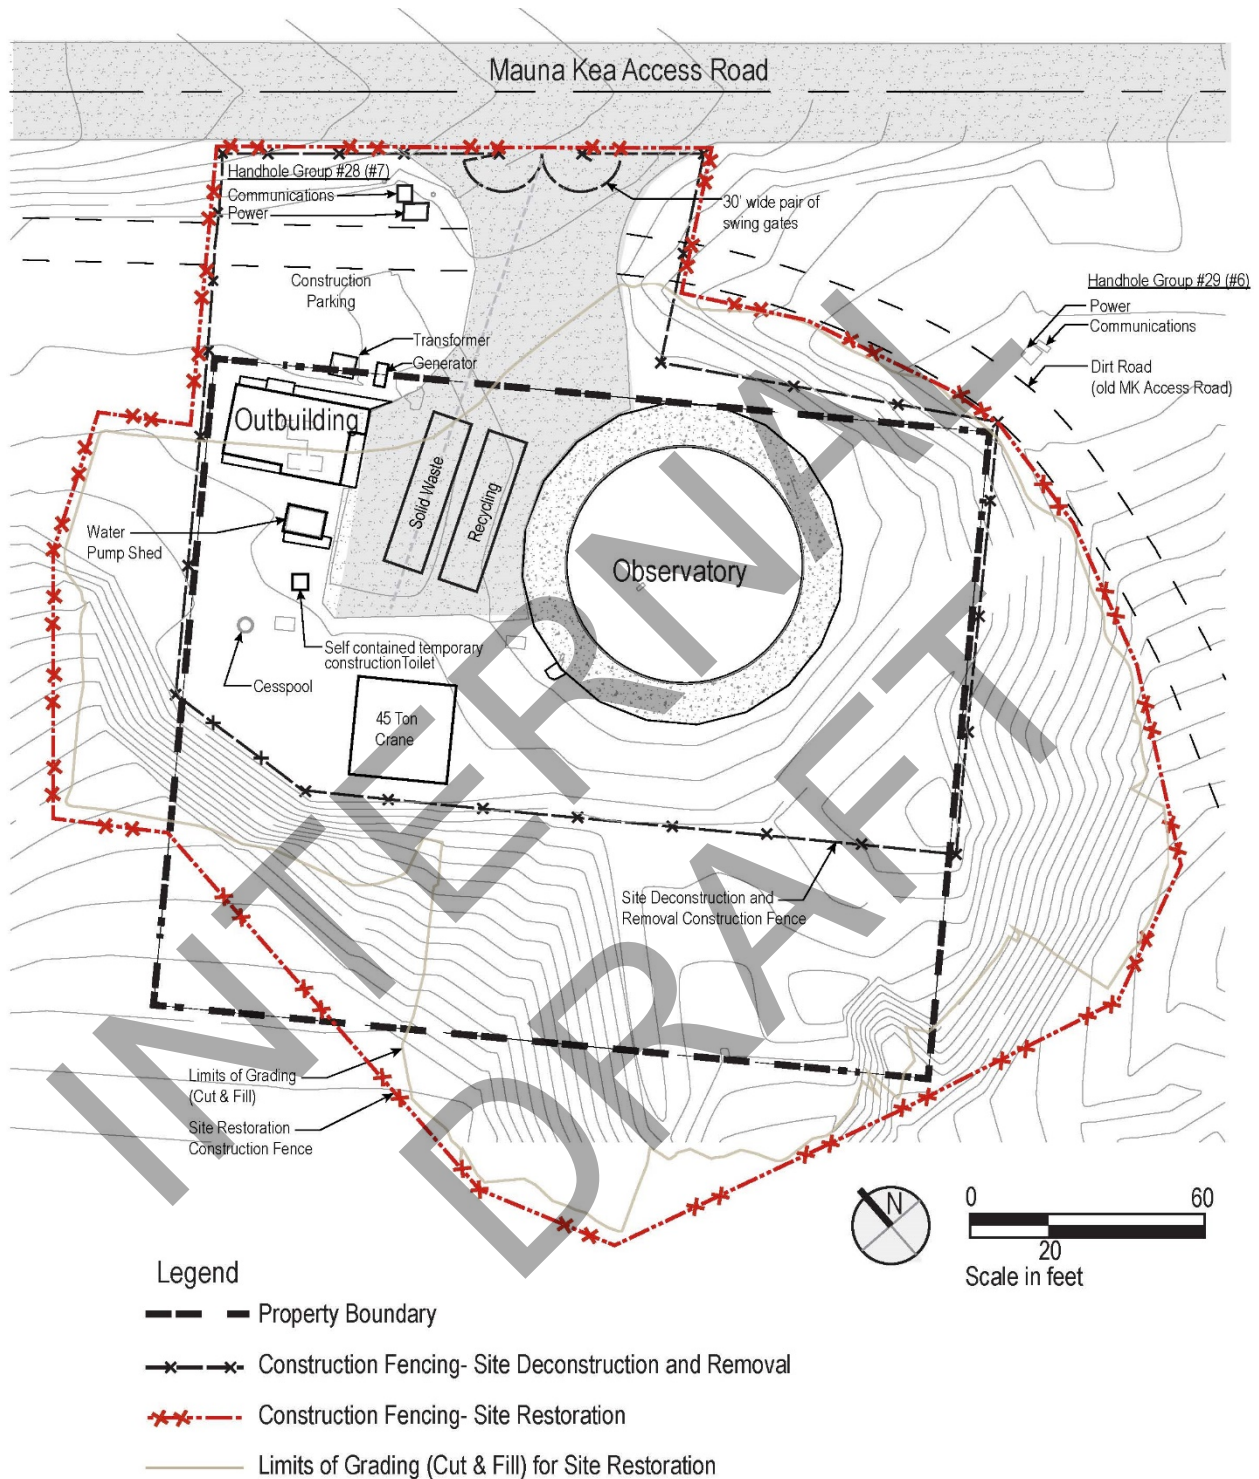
Conceptual Plan View of Overall Deconstruction Staging
